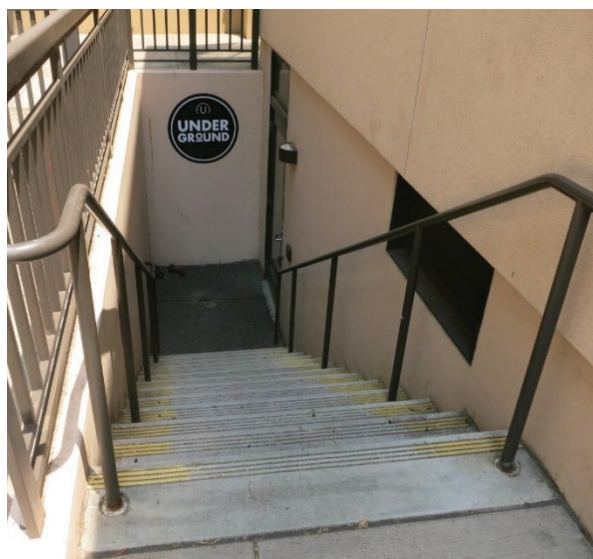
Detail of below-grade basement along west façade. Looking northeast.
